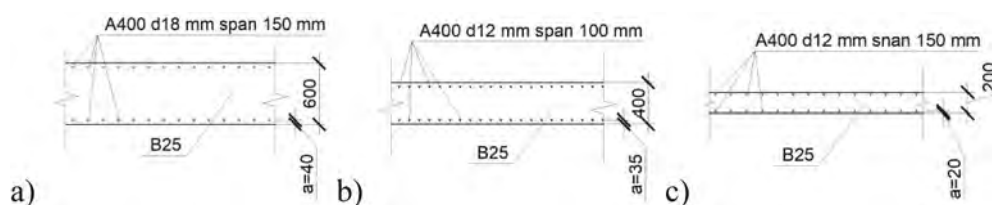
Structure of foundation and floor slabs in calculation models: a) – foundation slab 600 mm: $k_1 = 0,127$; b) – foundation slab 400 mm: $k_1 = 0,141$; c) – floor slab 200 mm, $k_1 = 0,163$, $k_2 = 0,144$, $E_{eq} = 4056461$ kPa, $h_{eq} = 0,212$ m.
